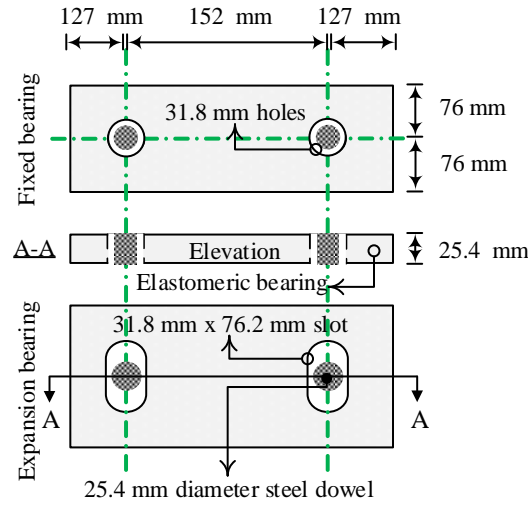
Plan and elevation view of the fixed and expansion bearings with steel dowels
